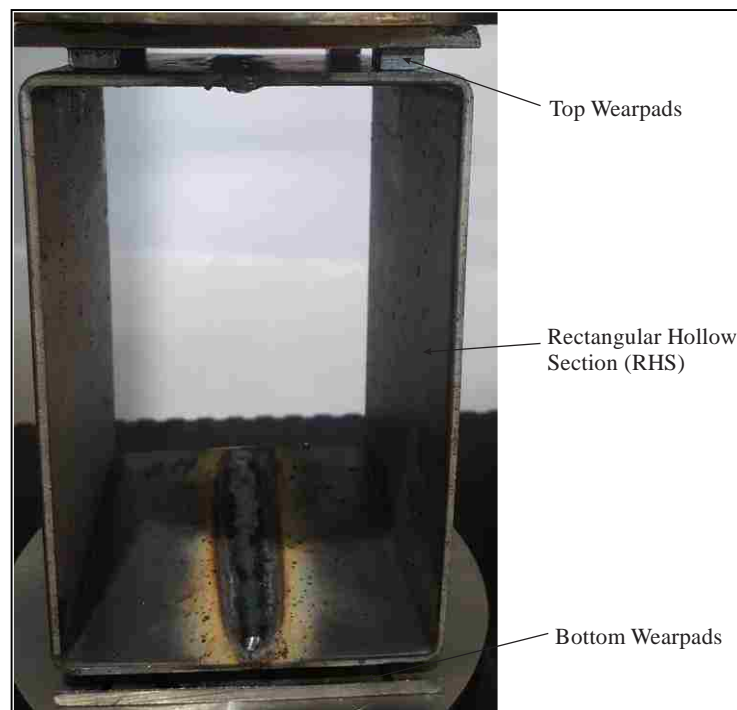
Loading assembly of RHS piece (height = 150 mm) between wearpads
